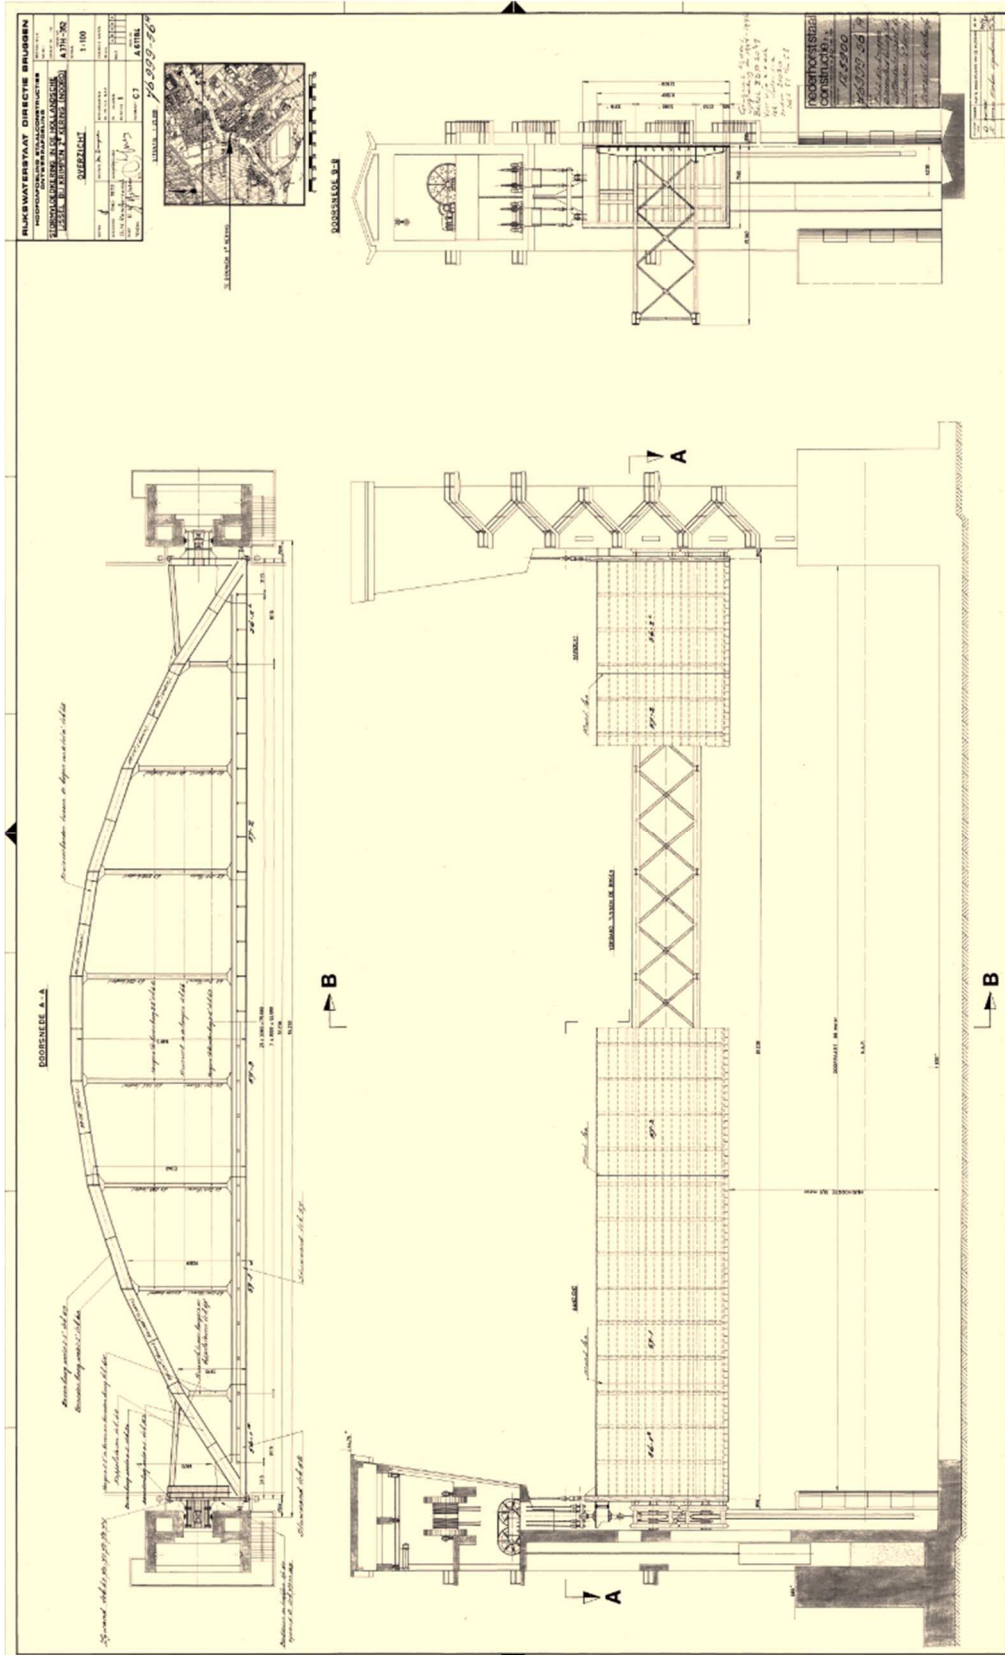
Technical drawing storm surge barrier 1978, source; Rijkswaterstaat
